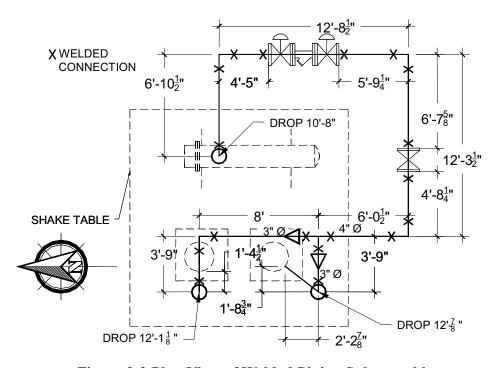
Plan View of Welded Piping Subassembly
